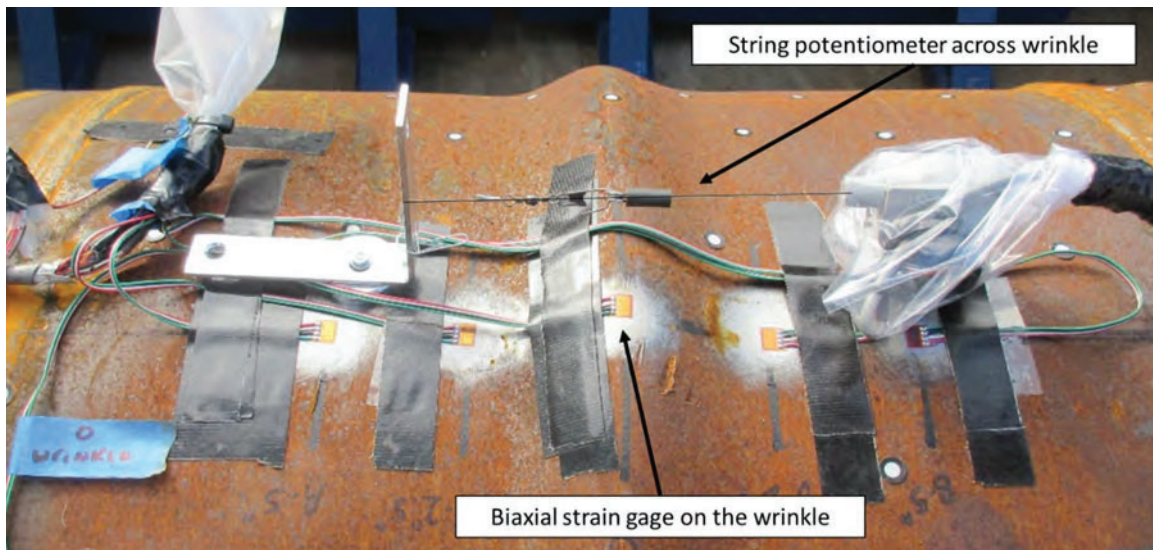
Biaxial strain gages and string potentiometer on wrinkle sample (Unreinforced sample shown)
